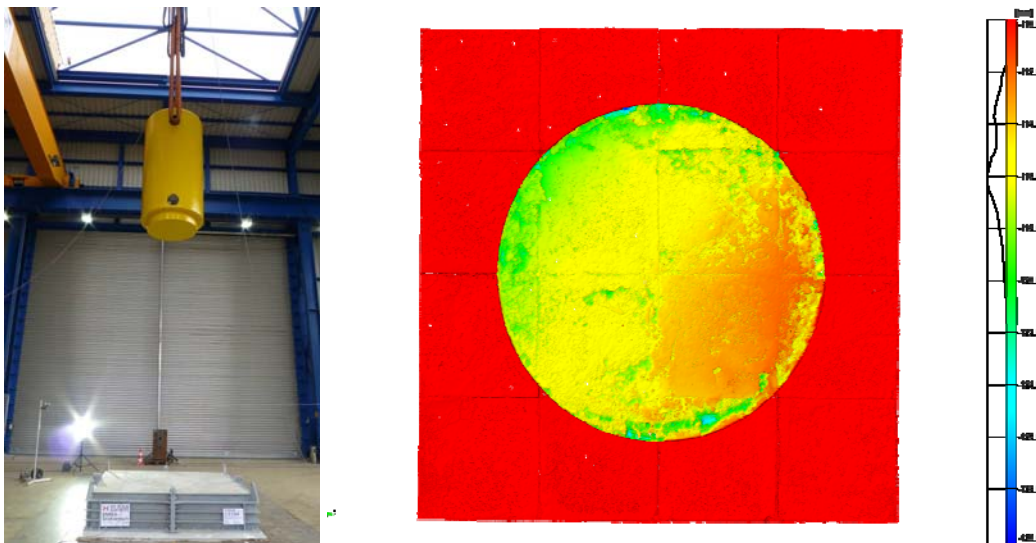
Test configuration of large scale drop test (left) and 3D measurement of the resulting imprint in the concrete foundation (right)
